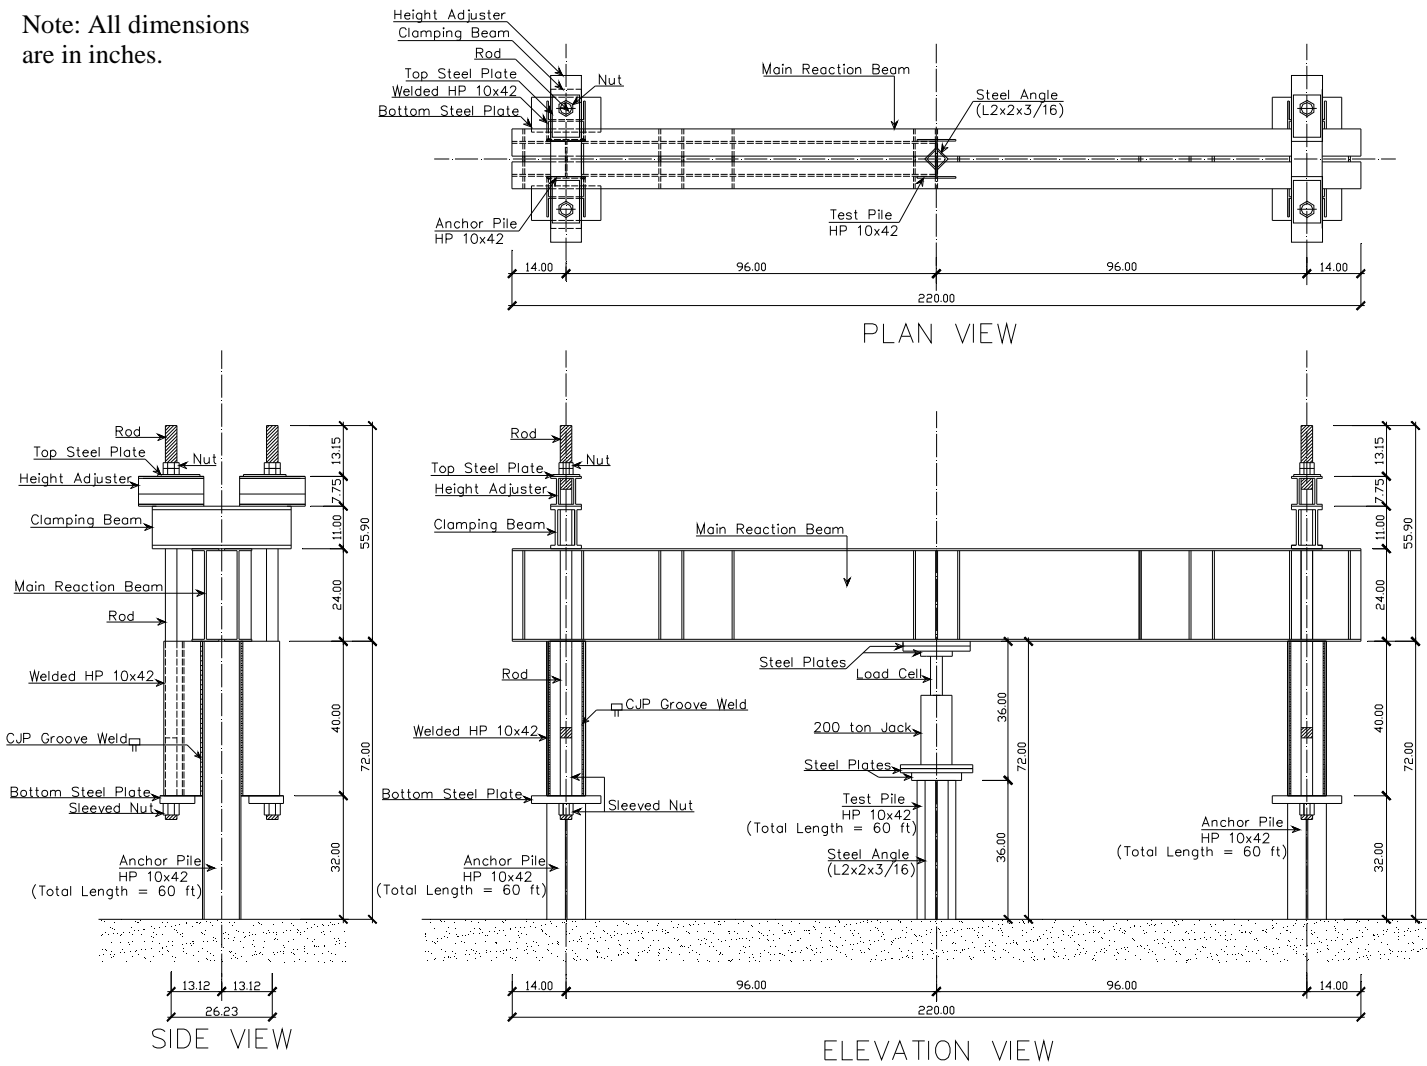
Typical Plan, Side and Elevation Views of the Vertical Load Test Setup used for Testing Piles in this Project
